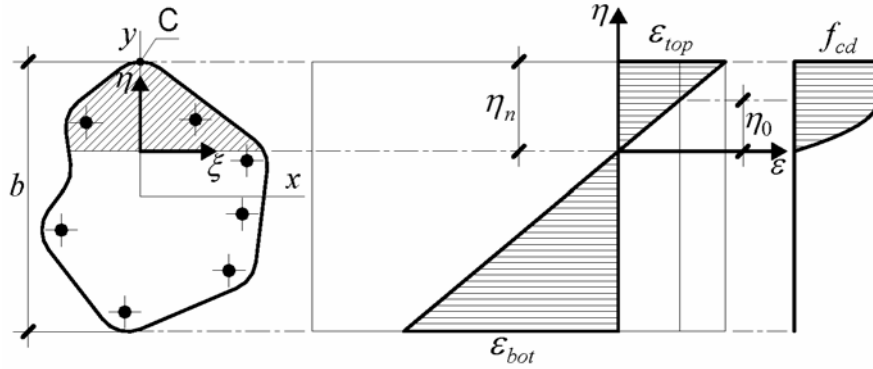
a) Generic reinforced concrete cross section, b) strain profile, and c) stress profiles.
